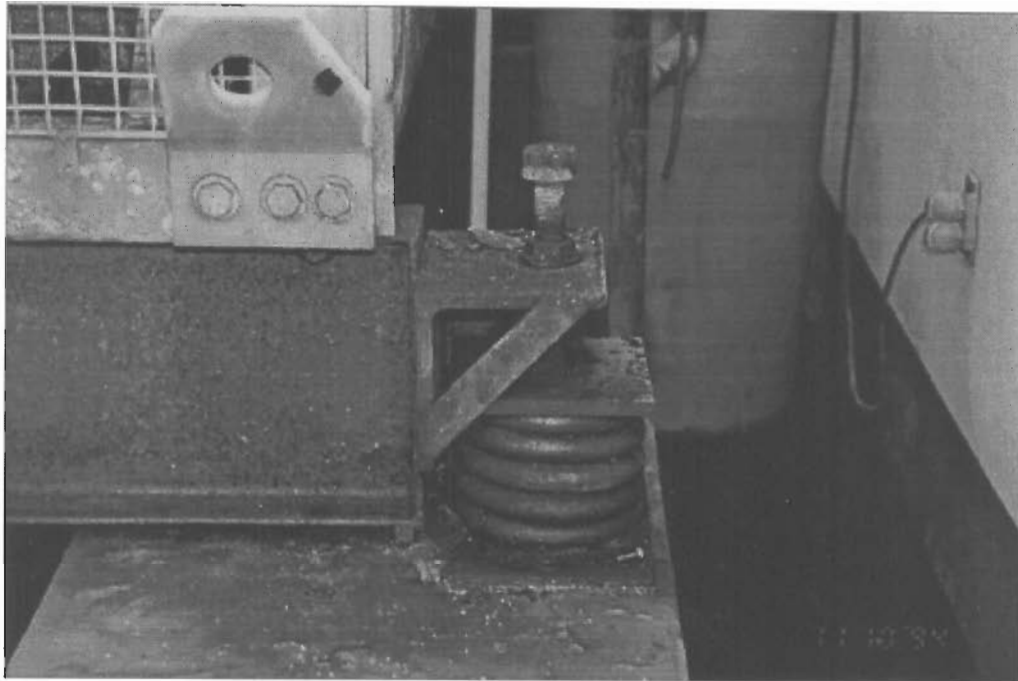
Mechanical equipment damage at the roof of BURBANK 6 building.
